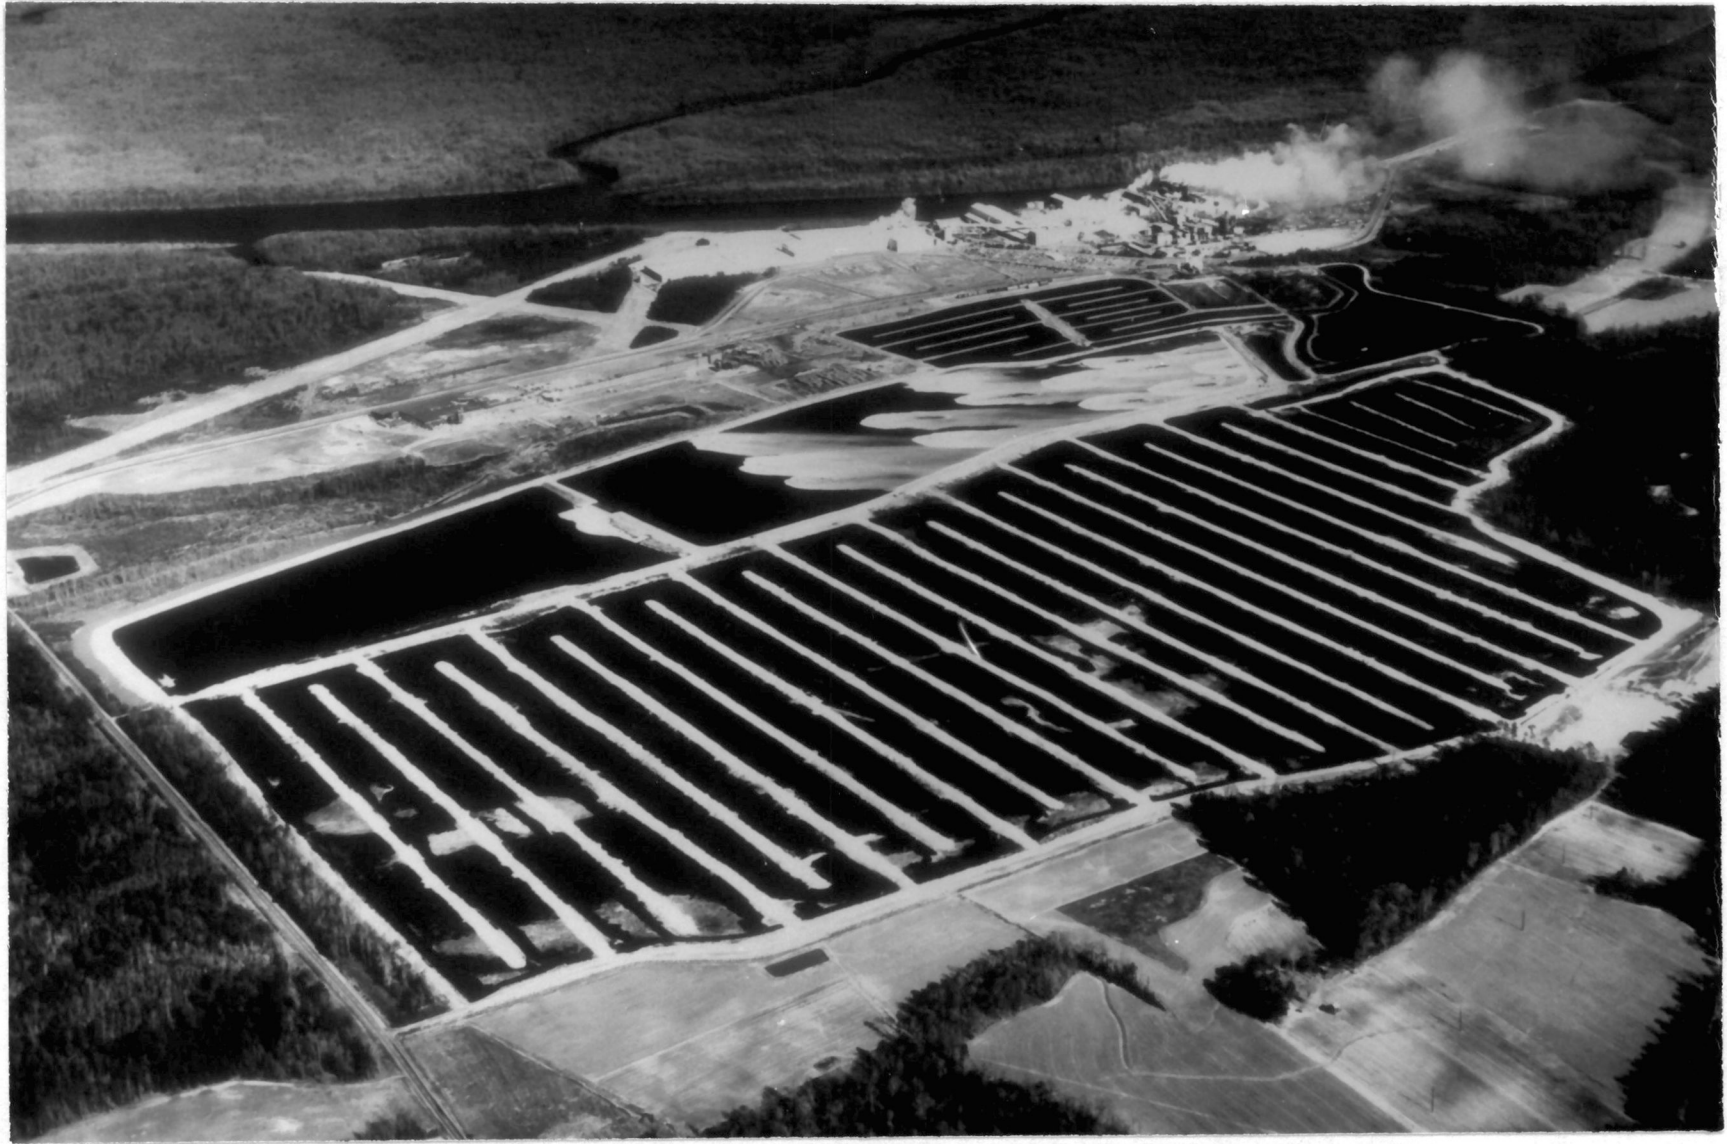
Since the site was surrounded by vacant land, the plant grounds could be expanded.
